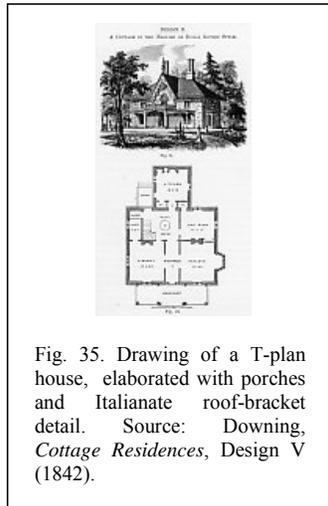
Drawing of a T-plan house, elaborated with porches and Italianate roof-bracket detail. Source: Downing, *Cottage Residences*, Design V (1842).
